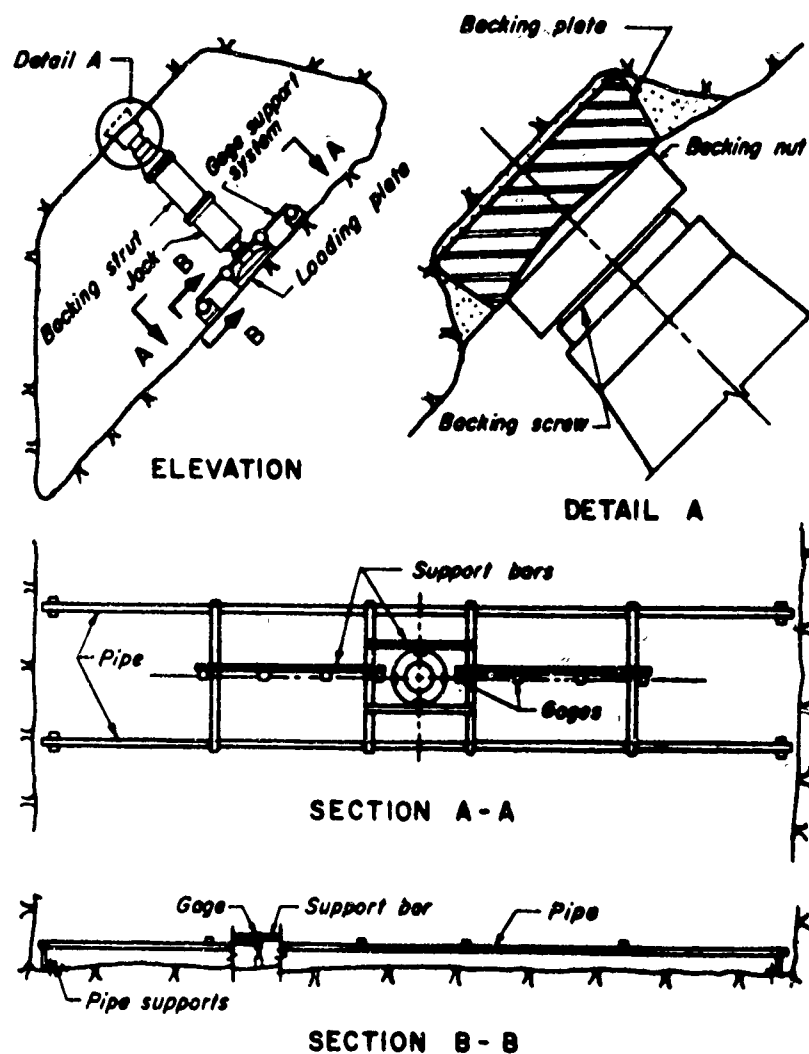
KARADJ DAM PLATE JACK TEST
